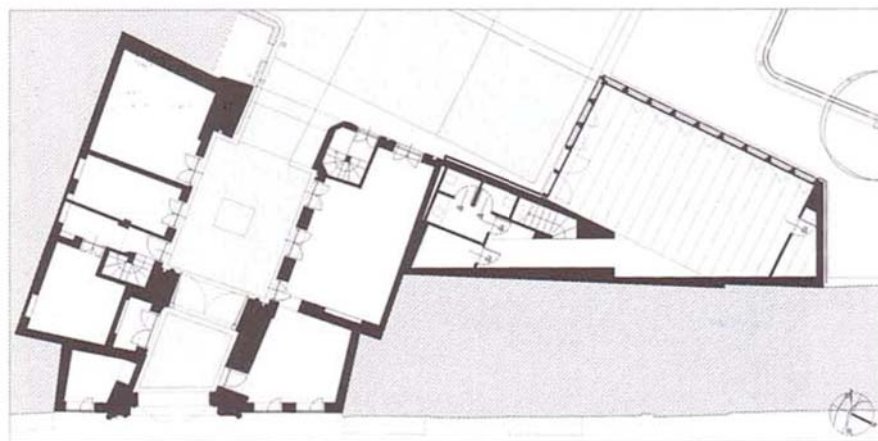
Ground level: the Musa Pak Courtyard Darbar and P.I.R.C building planimetric drawing
